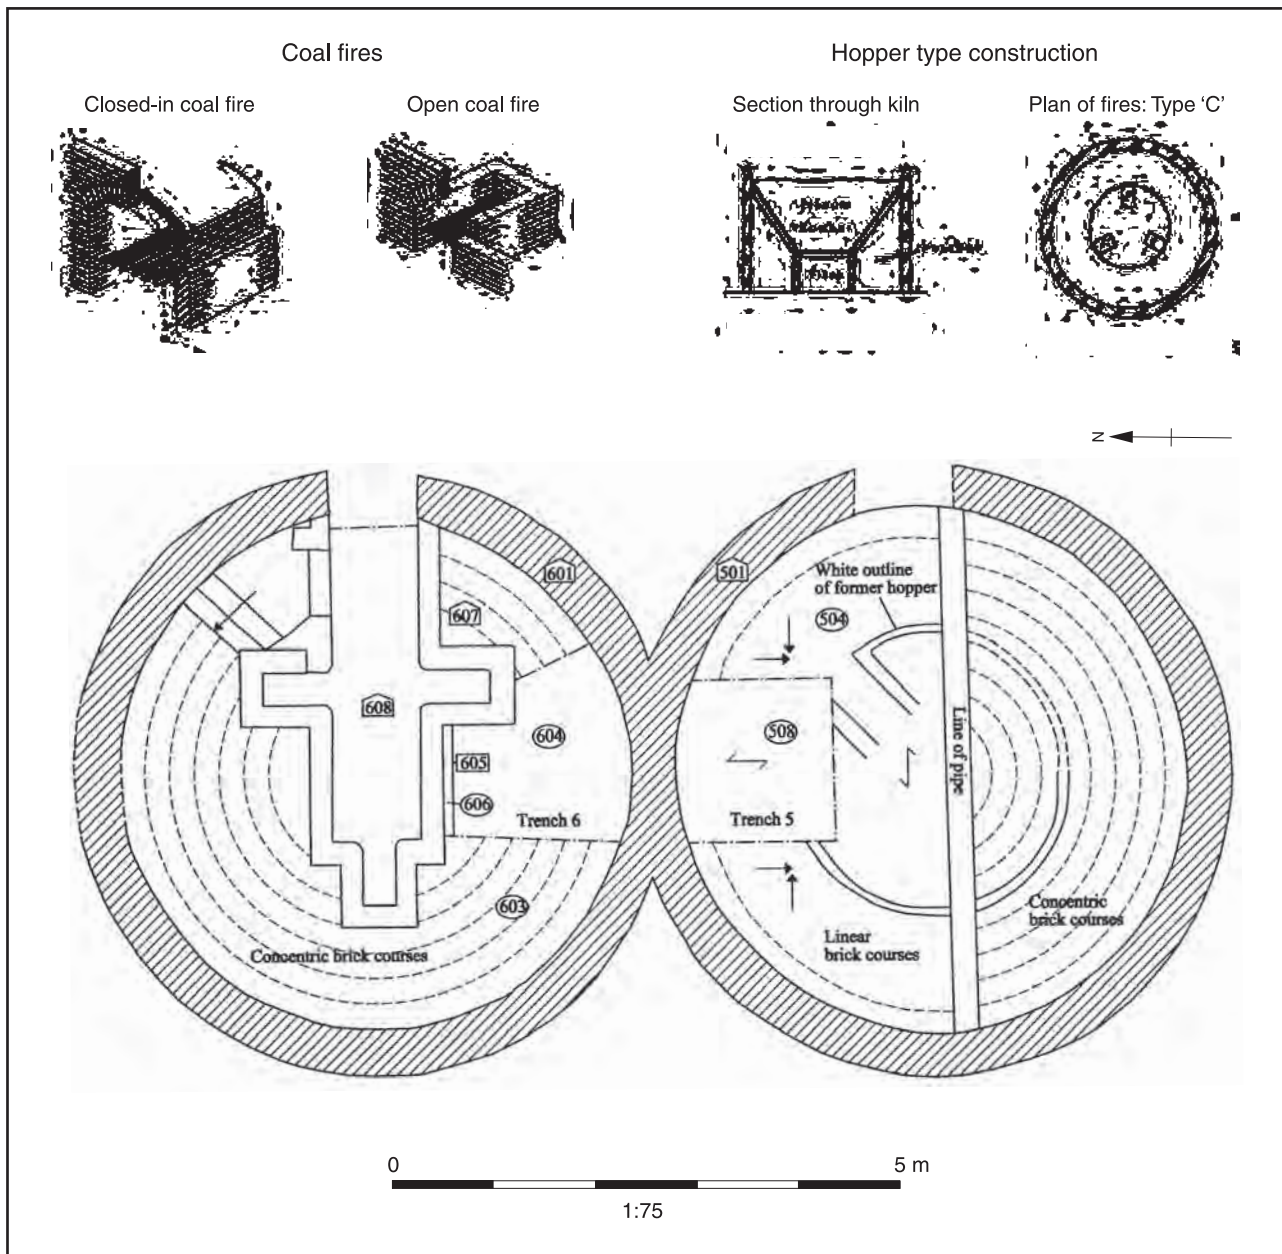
Yonse Farm: plan of drying kilns within oast
